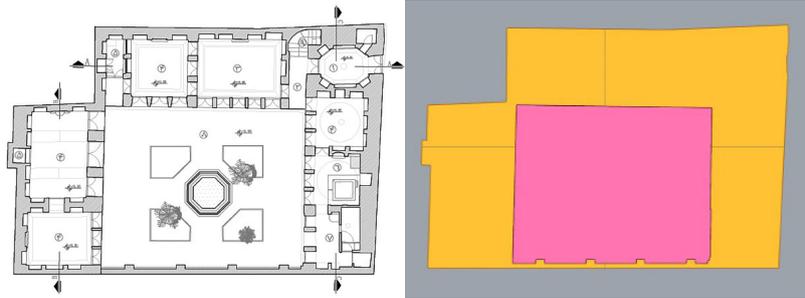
Jangjouyan House's Plan (Geometry of Mass and Space in the Plan)
